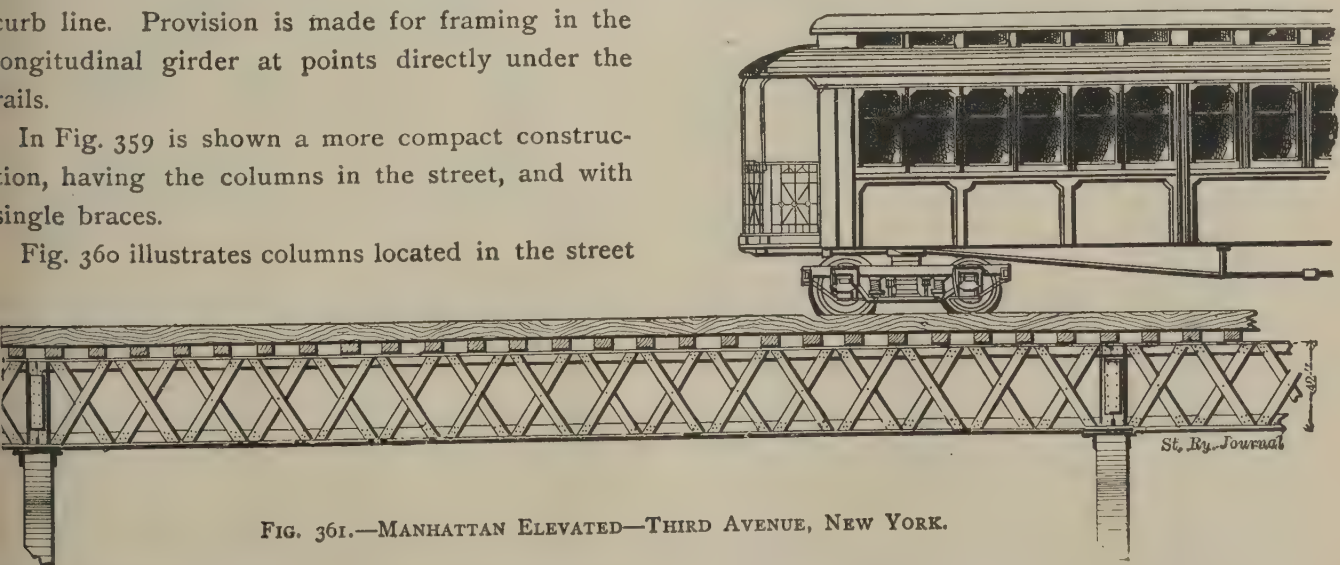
MANHATTAN ELEVATED—THIRD AVENUE, NEW YORK.
